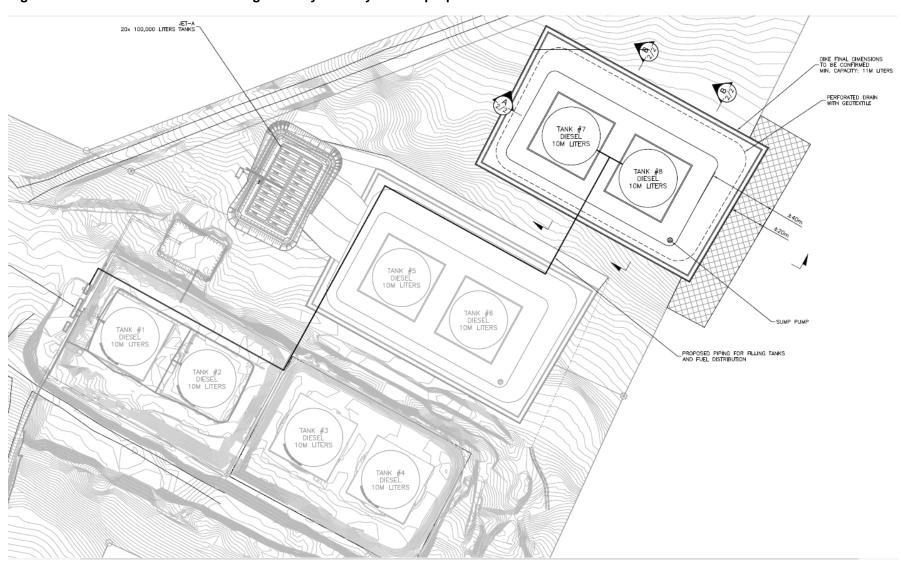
Baker Lake Bulk Fuel Storage Facility Site Layout and proposed location for Tank #7 and #8
